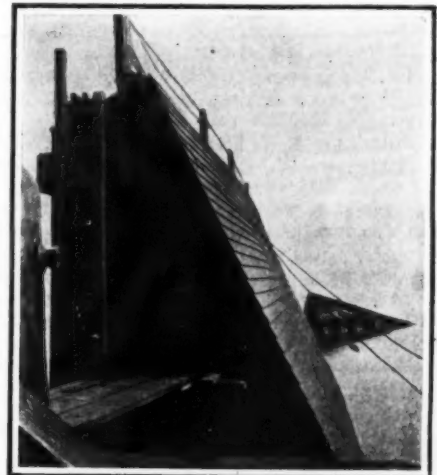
DETAIL OF ROOFING SYSTEM FOR PROTECTING PILING.
